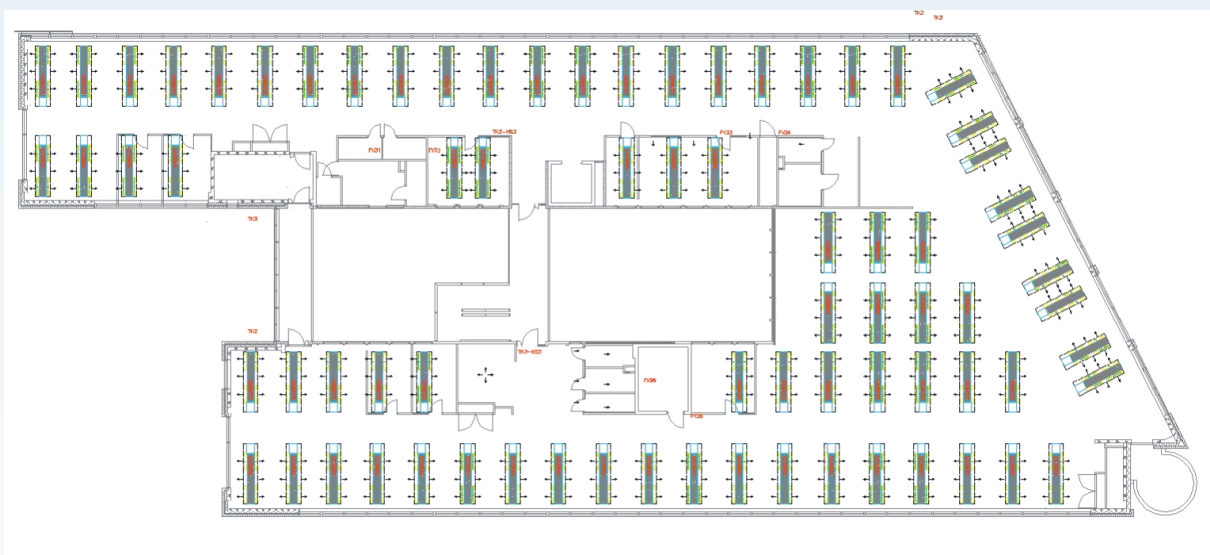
Chilled beam units on the third floor (floors 1 to 4 have a similar arrangement).
